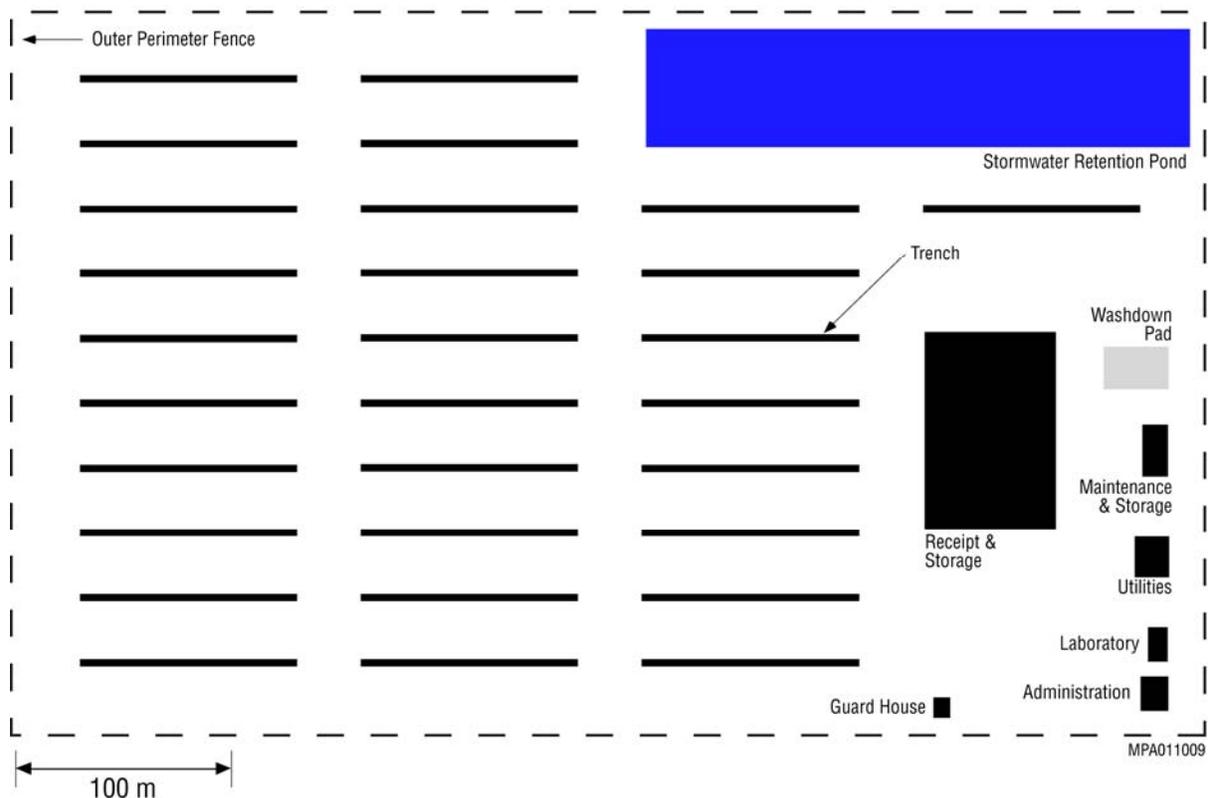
shows the layout of a conceptual enhanced near-surface trench waste disposal facility. It is estimated that approximately 29 trenches would be required for the disposal of the 11,650 m<sup>3</sup> of waste currently under consideration. Trenches would be spaced 30 m (98 ft) apart within a facility footprint of about 45.5 ac that is 550 × 334 m (1,808 × 1,096 ft) at the fenceline. The conceptual design incorporates a retention pond that would be 251 × 55 × 0.30 m (825 × 180 × 1 ft) in size to manage stormwater runoff. The proposed size of the pond may need to be modified depending on site-specific conditions, including precipitation.
